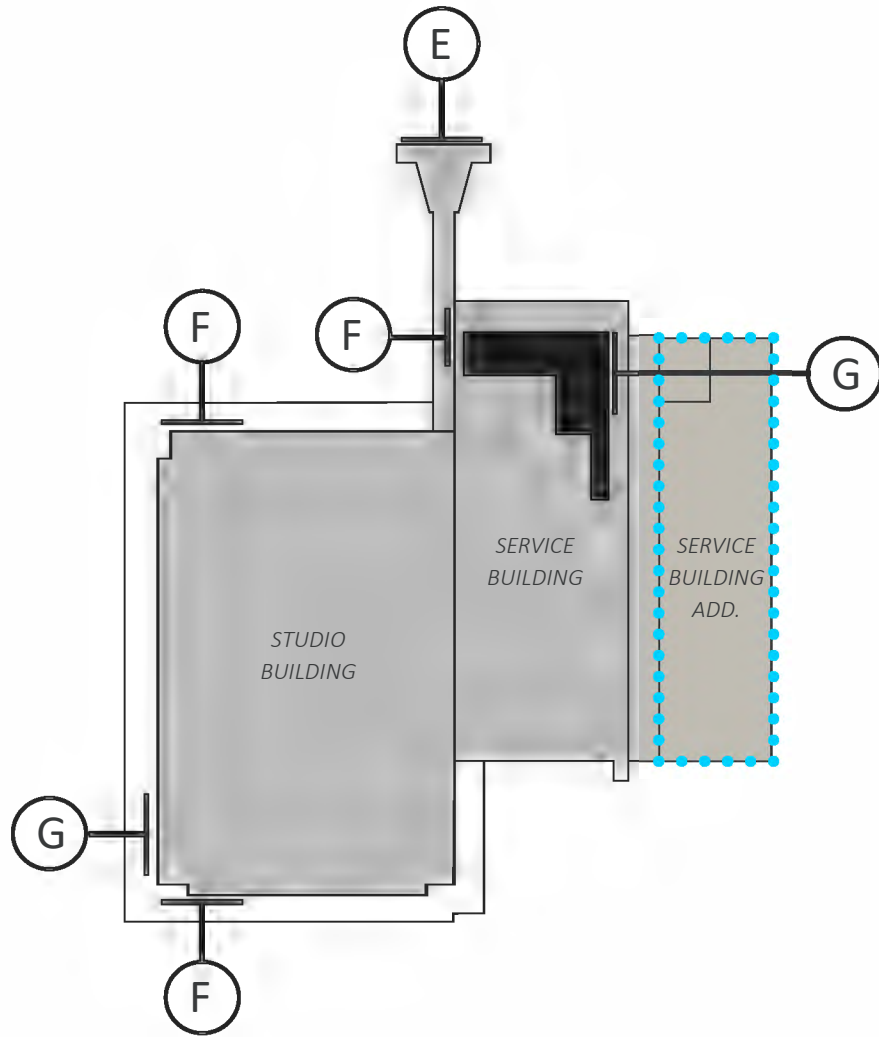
At left: TVC Primary Studio Complex, with the future exterior viewshed area indicated in red. The portions of the building outlined in dotted blue are later additions and are not included in the HCM designation.
